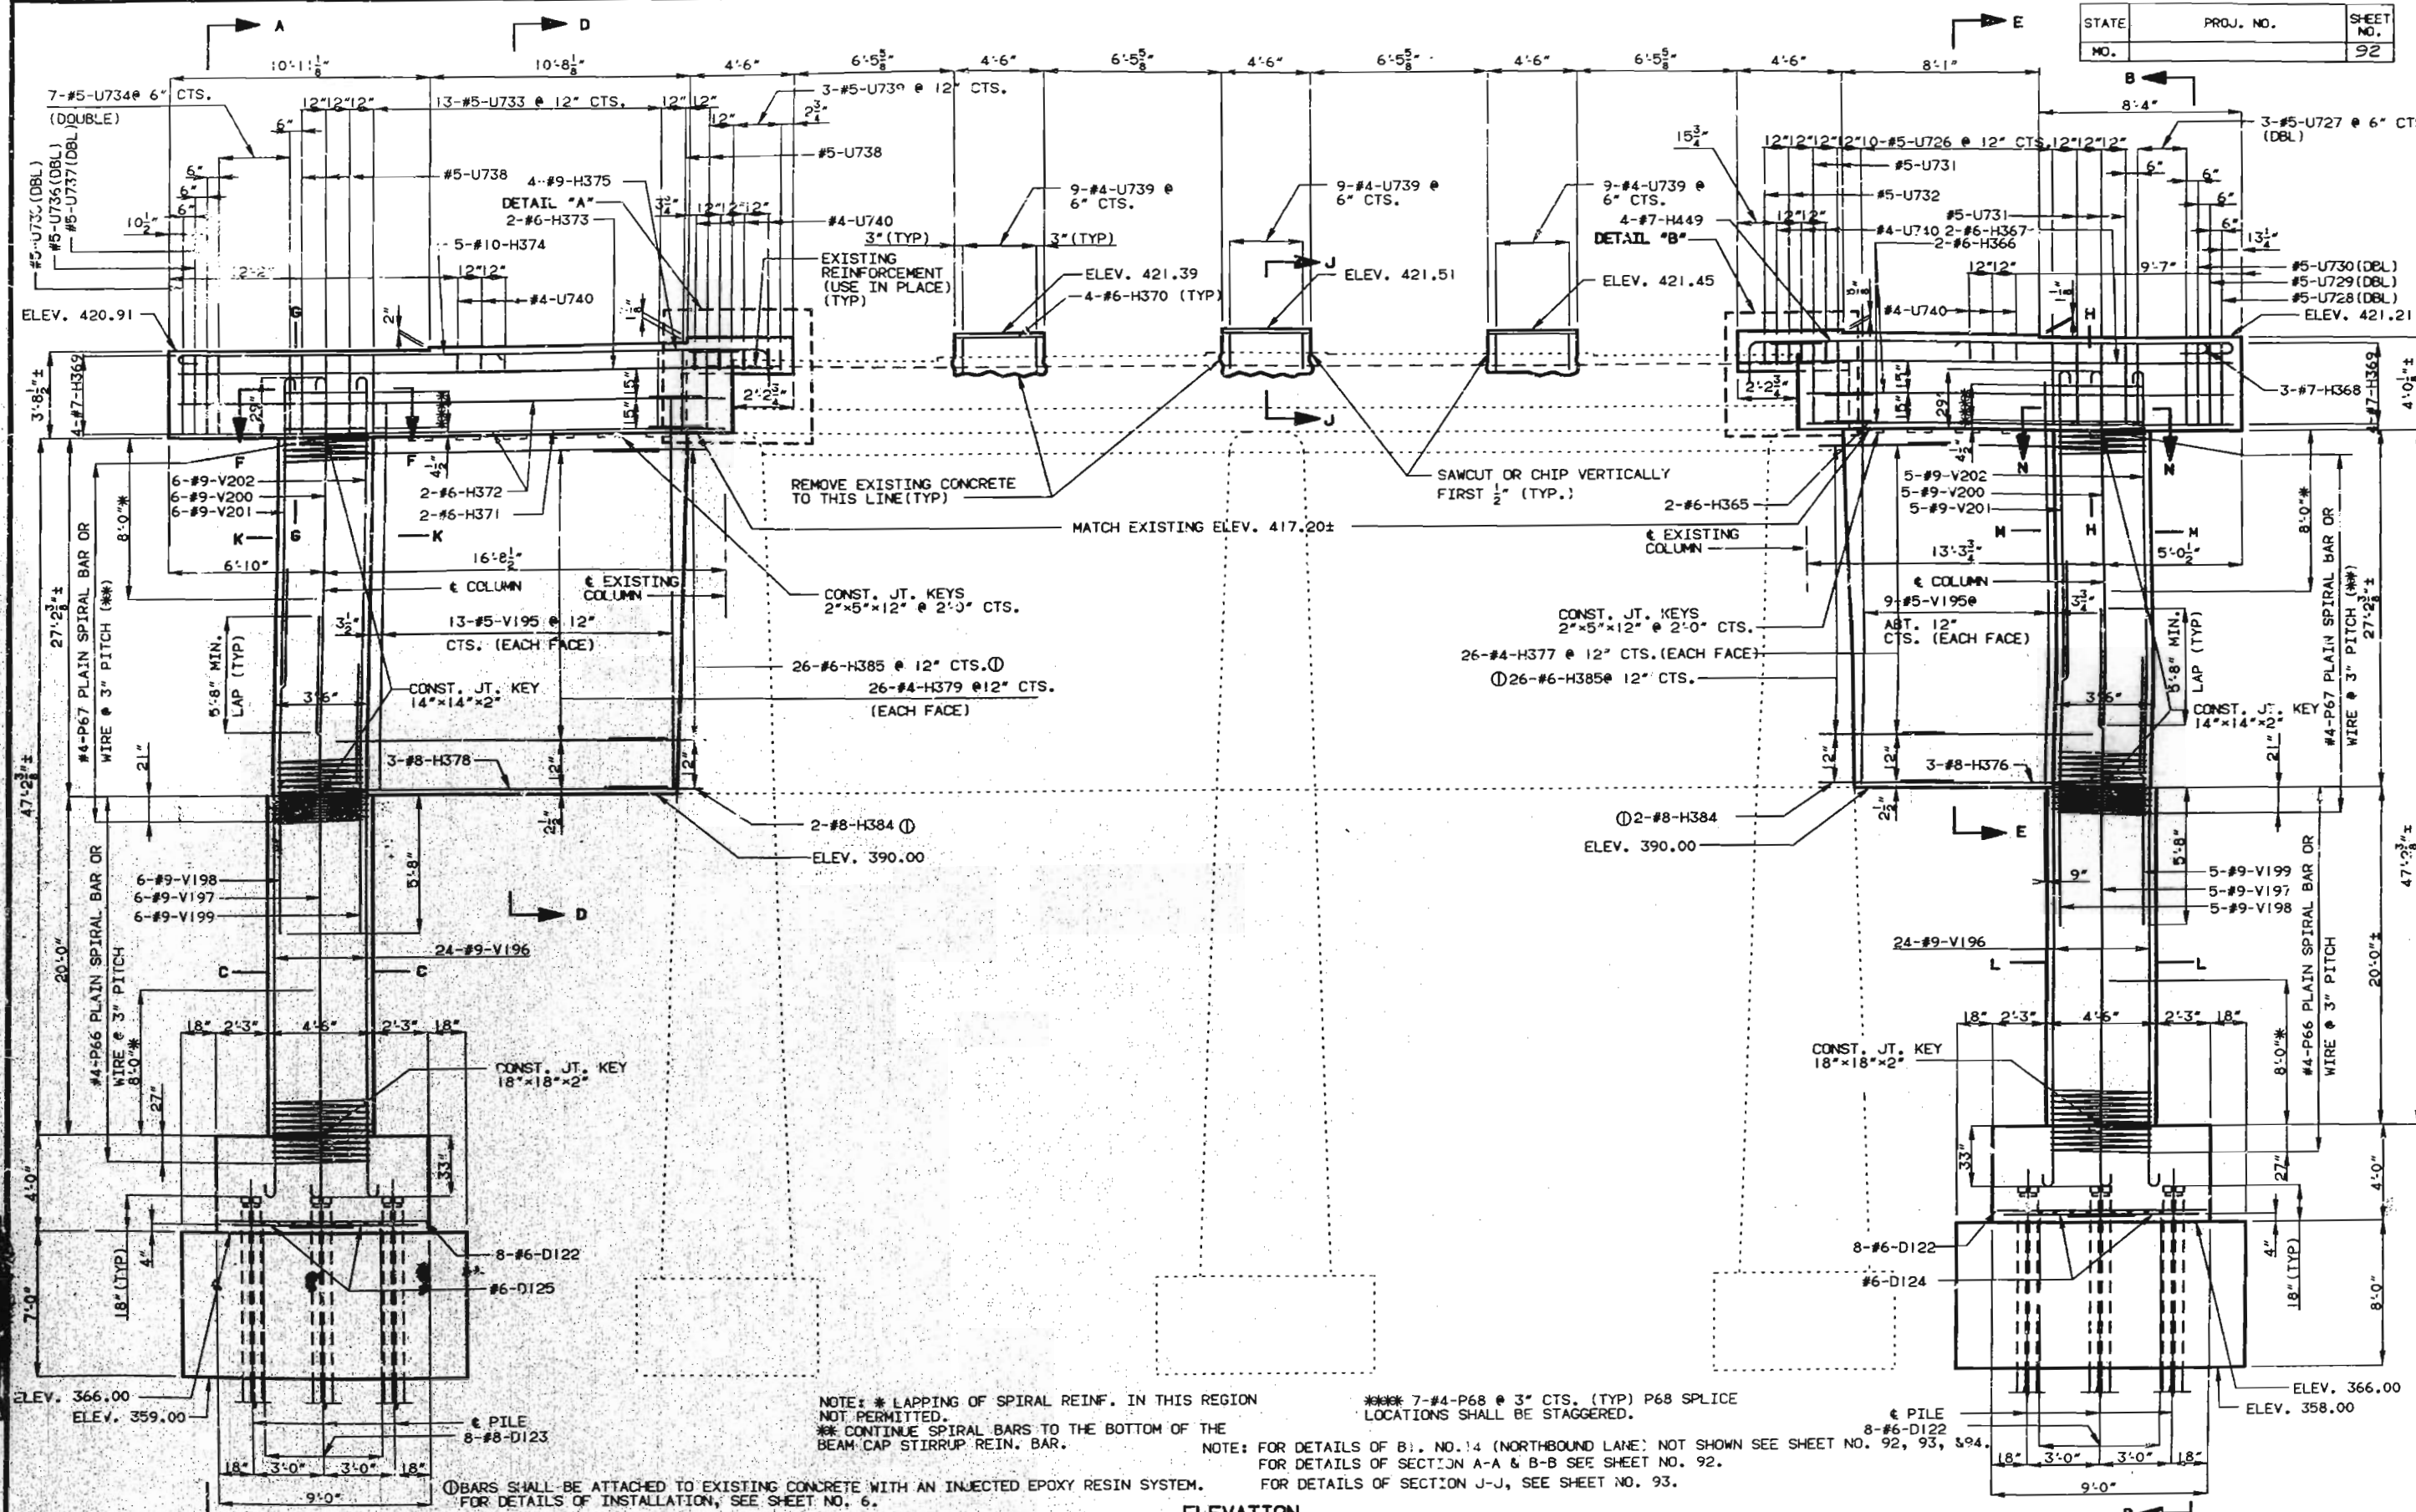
DETAILS OF INT. BENT NO. 13 (SOUTHBOUND LANE)
